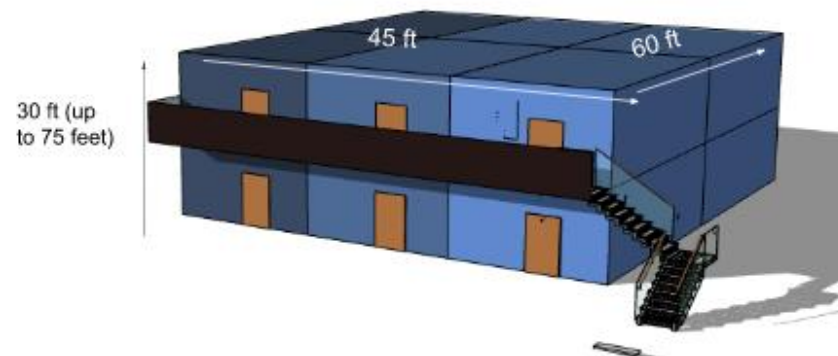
Exterior Design of Aquilae Hotel – 2 floors shown (Jaikrit, SketchUp)
